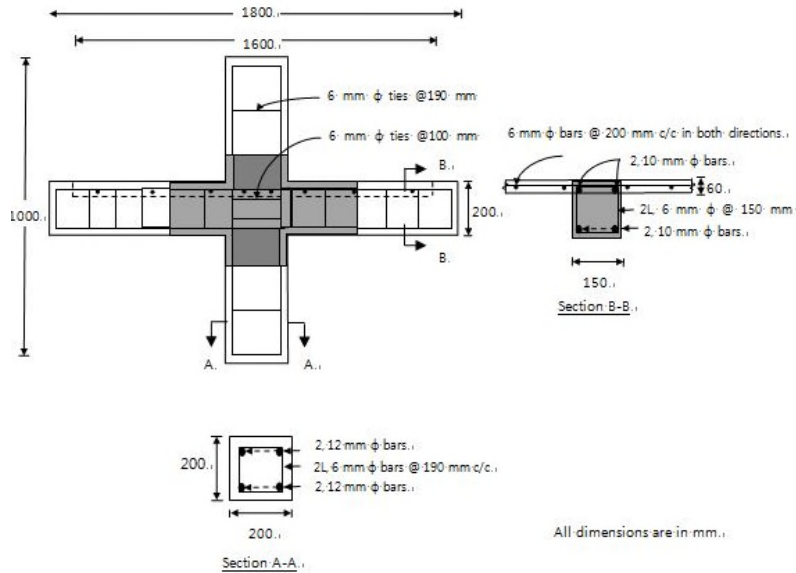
Details of reinforcement beam-column-slab joint specimen
